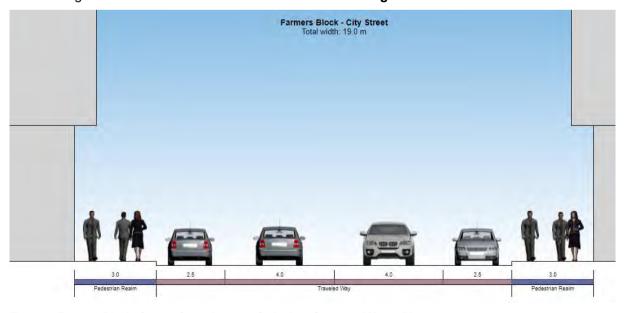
Farmers Block: George Street between St Andrew Street and Moray Place
